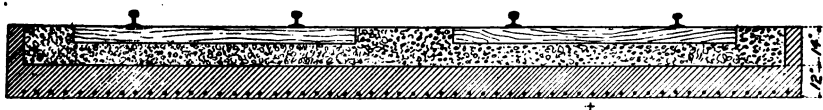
Railroad Bridge of 10 ft. span, Reinforced Slab Construction.
